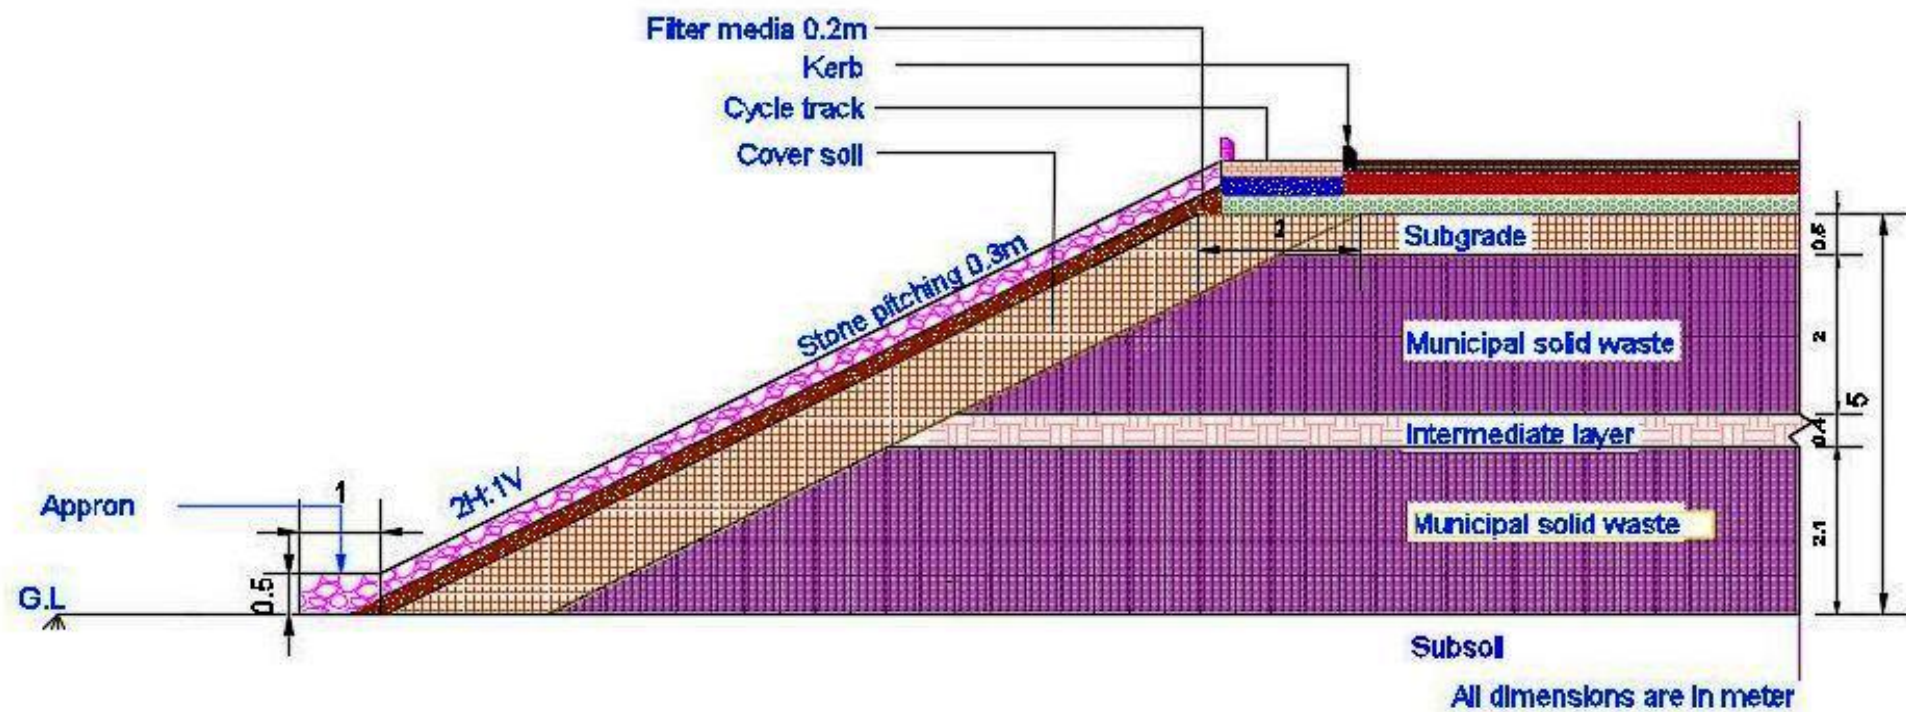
Cross –section for construction of 5m Height MSW embankment (Built up area)
